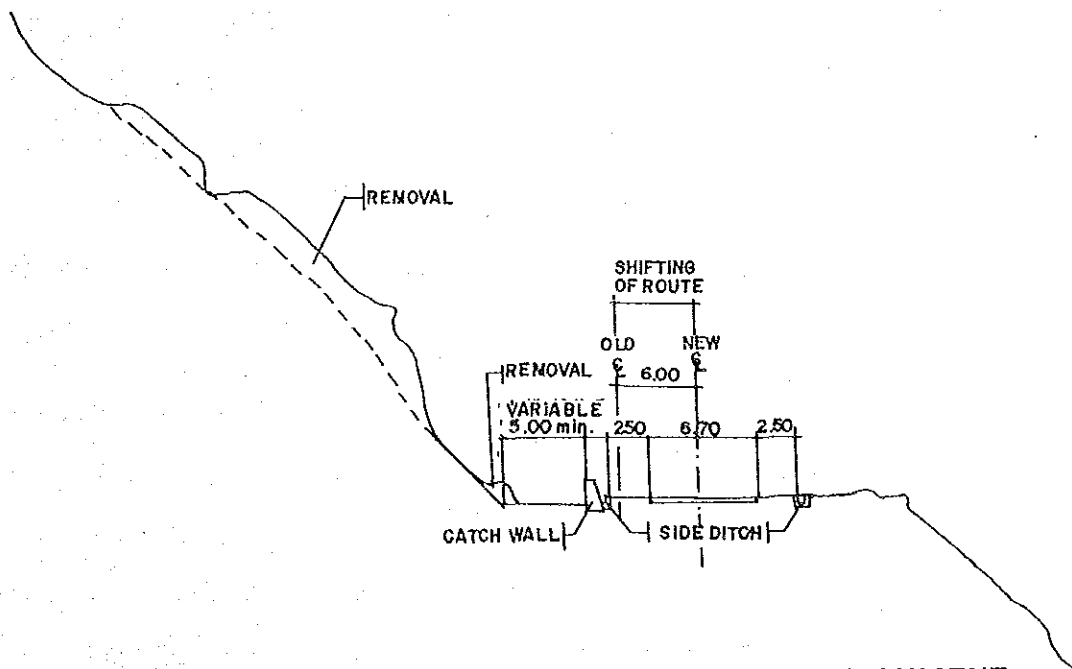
TYPICAL CROSS SECTION OF RE-ALIGNMENT
